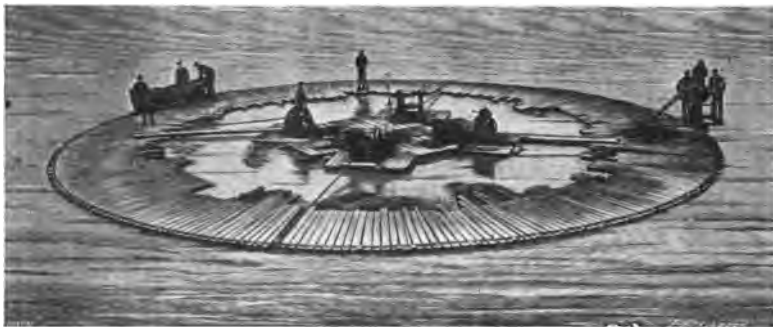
SURVEYING RAFT, FORTH BRIDGE PIERS.
